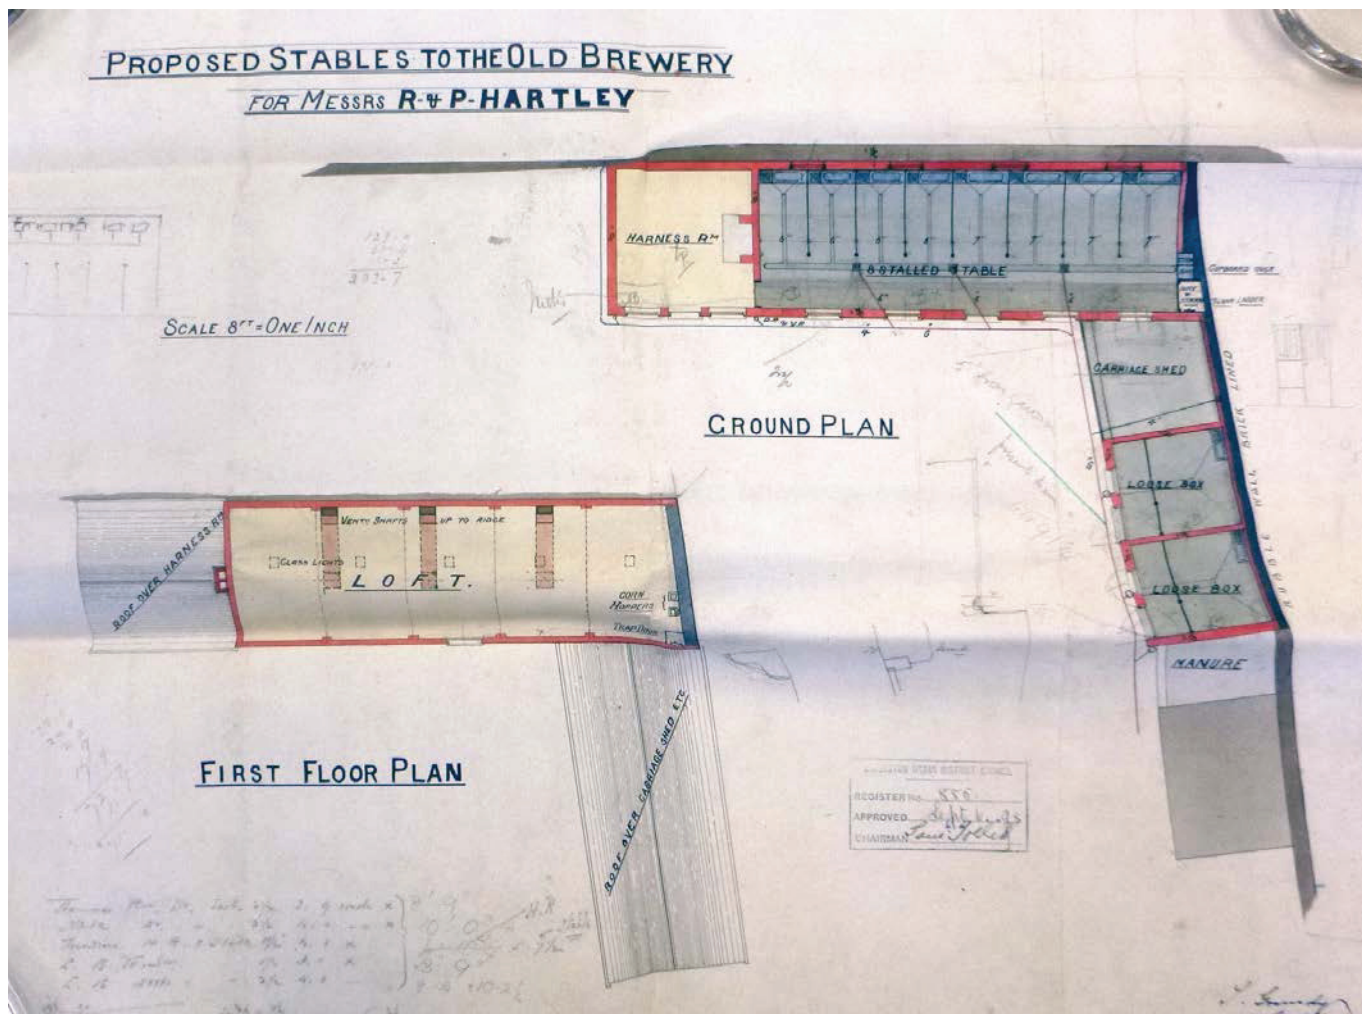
Ground floor and first floor plan for proposed stables to the Old Brewery, 1898
